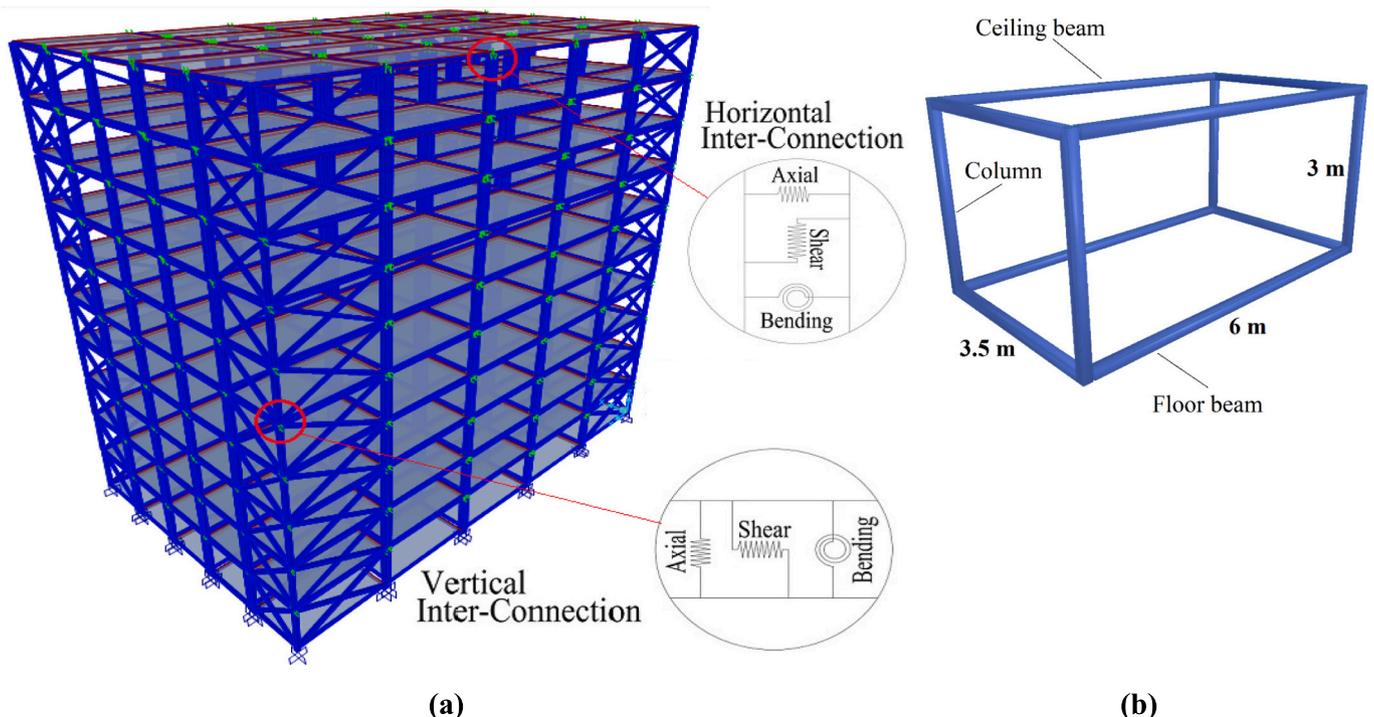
3D view of (a) 10-storey steel modular building system (MBS) and (b) Single module.
